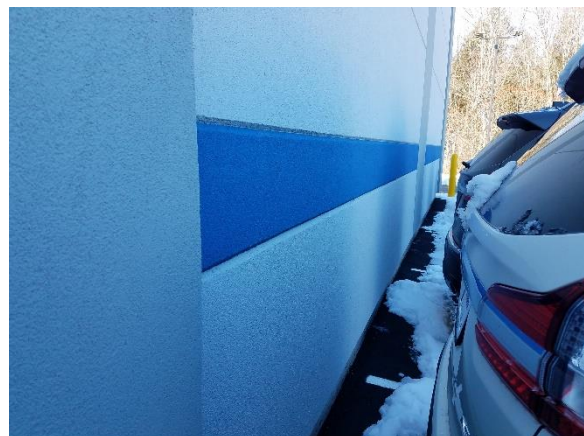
Photo taken 2/14/20 to show the appearance of the north facade of the addition to the Subaru building, which faces Rt. 101.
